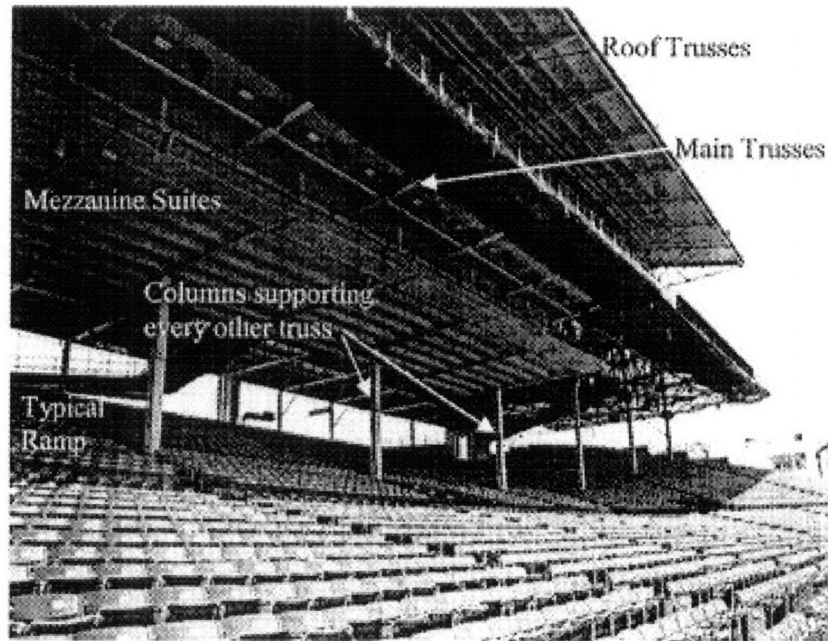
Third base side showing upper-deck support columns and trusses [7]
